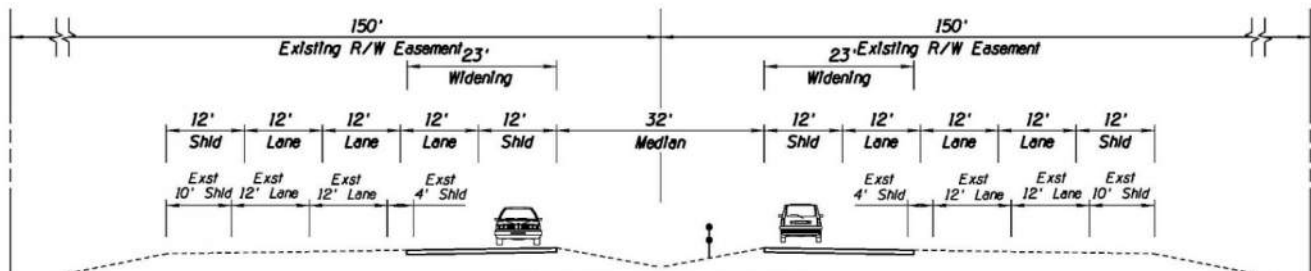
shows the proposed I-10 cross-section with six lanes between Riggs Road and SR 387/SR 187/Pinal Avenue. The general purpose lanes would be 12 feet wide. Both the outside and inside shoulders would be 12 feet wide. This portion of I-10 would have a 32-foot-wide median, with a
